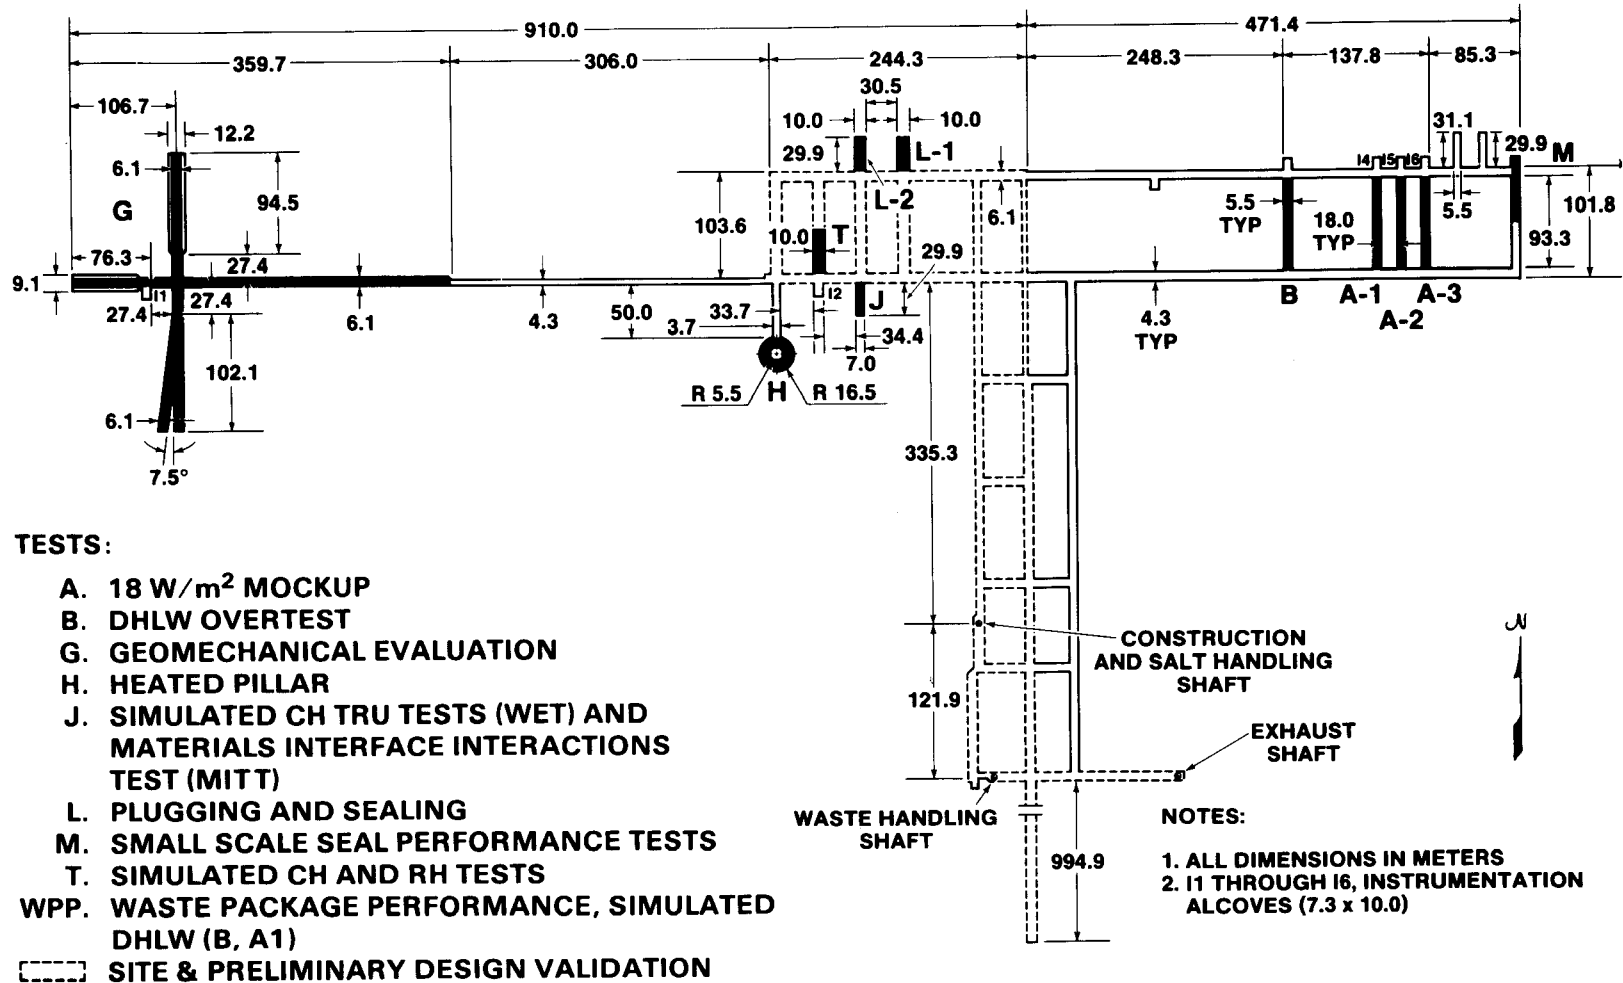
Plan View of the Underground Facility at the WIPP
